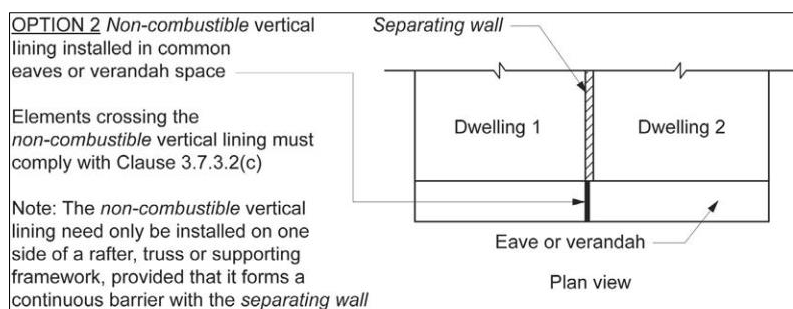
EXAMPLE OF VERTICAL SMOKE SEPARATION IN COMMON EAVE.
